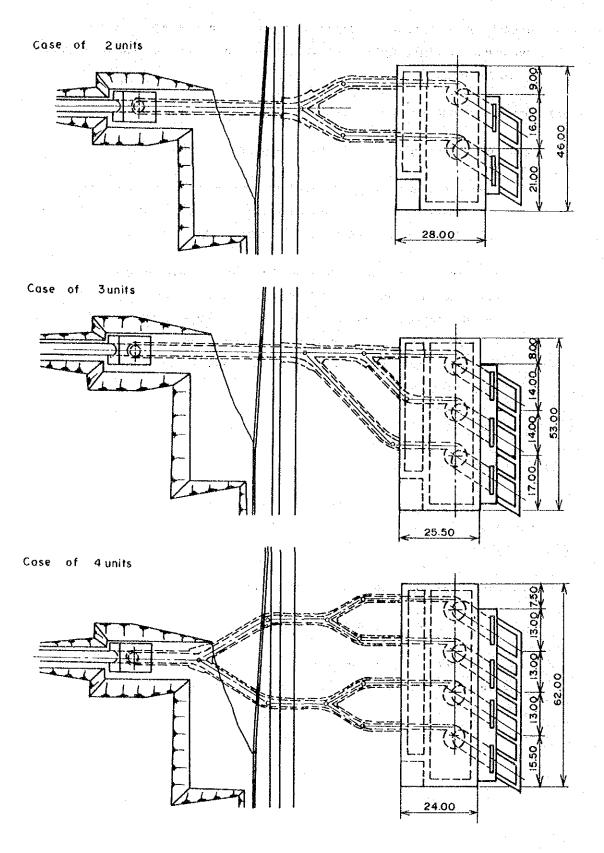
Plan of Powerhouse Area of Pelton Turbine Type
